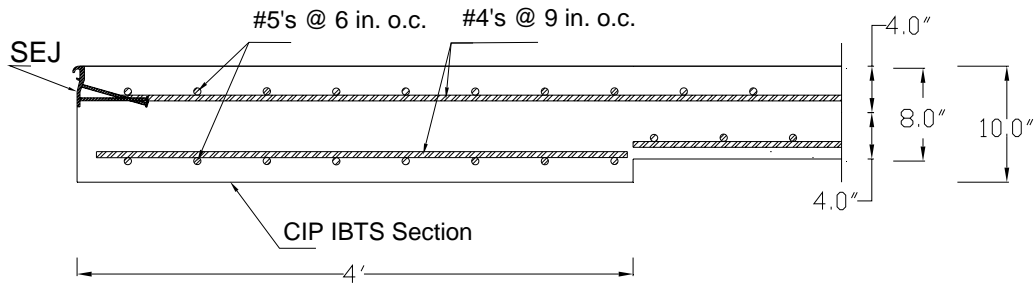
Simple Cross Section View of the IBTS Detail at Expansion Joints
